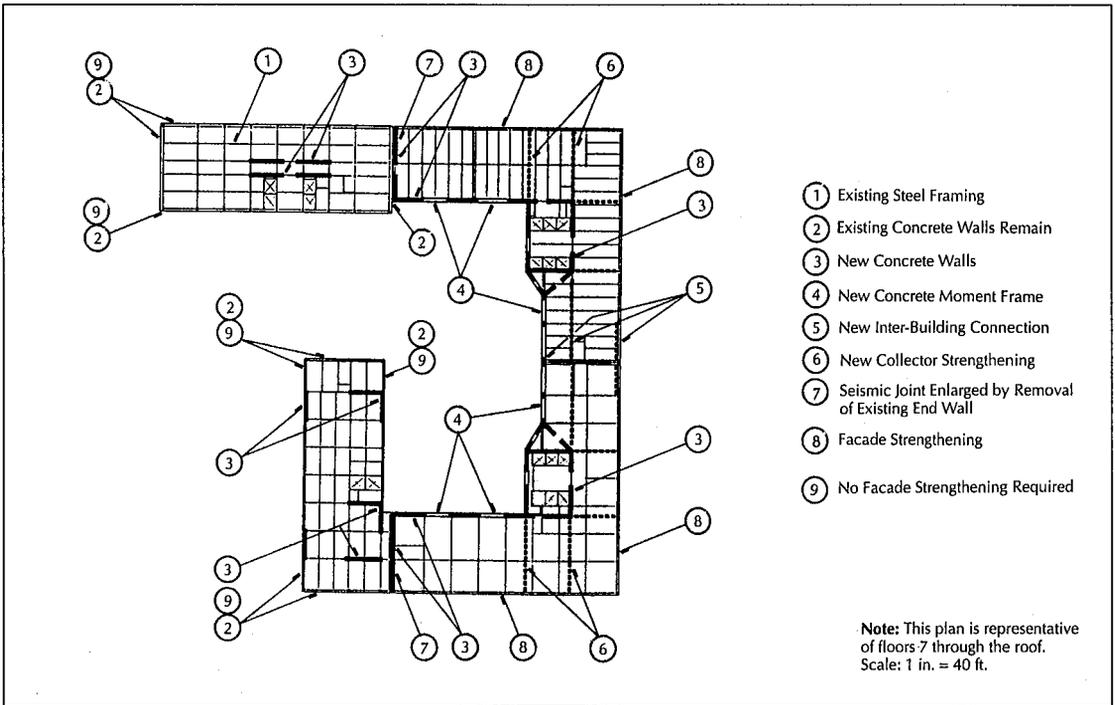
Upper level framing plan for the PG&E Market Street complex.
